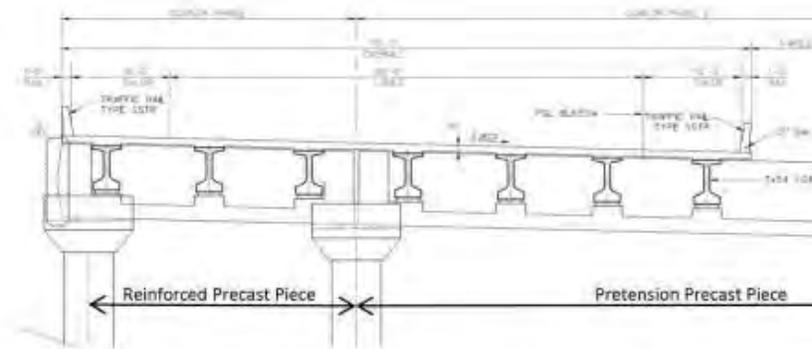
Precast caps with only reinforced vs precast and pre-stressed
